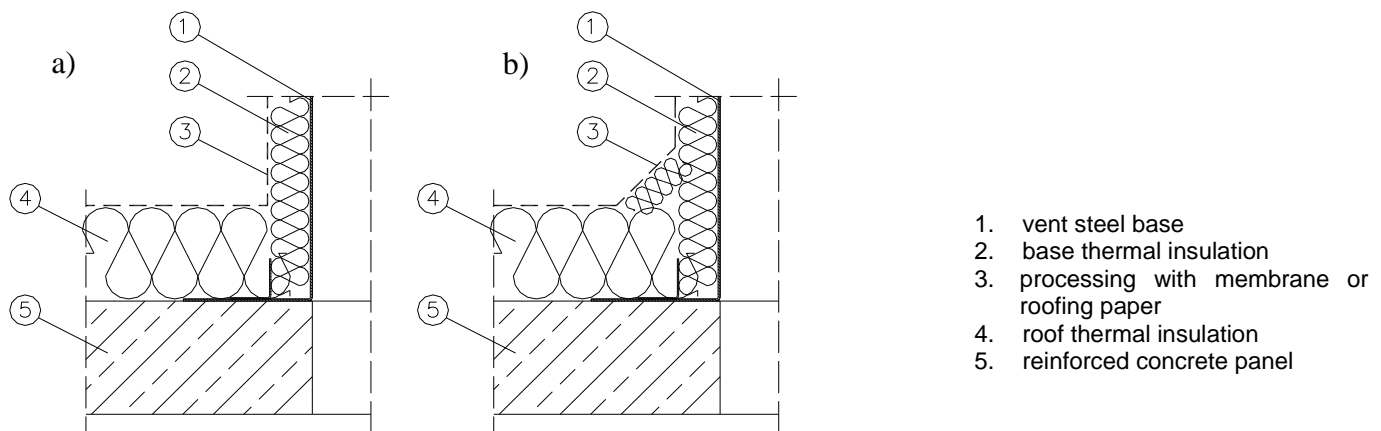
Steel base on a reinforced concrete panel (a - membrane flashing, b - roofing paper flashing)
